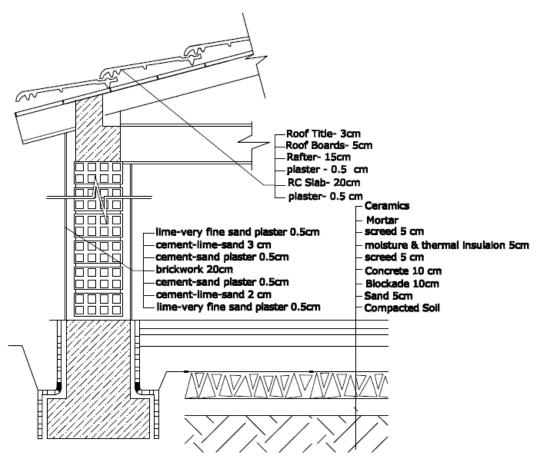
Construction Technique in Contemporary period- Brick wall - C9
